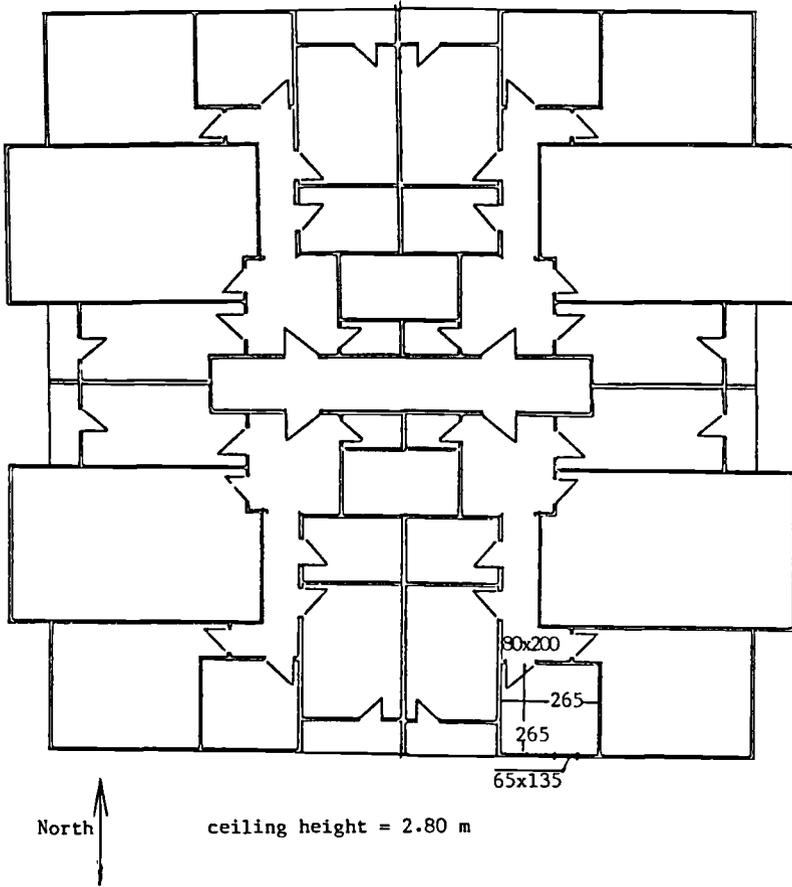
Floor plan of the five-story apartment building constructed by traditional technology in the second site.
